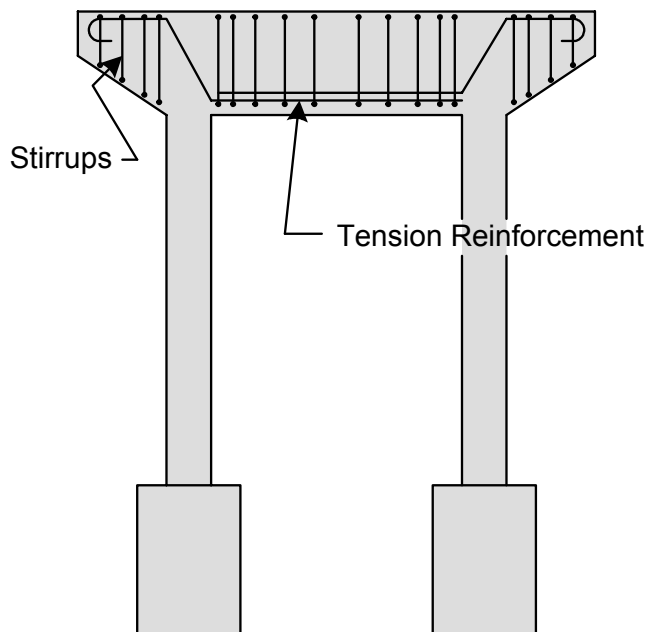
Spandrel Bent Cap Reinforcement
